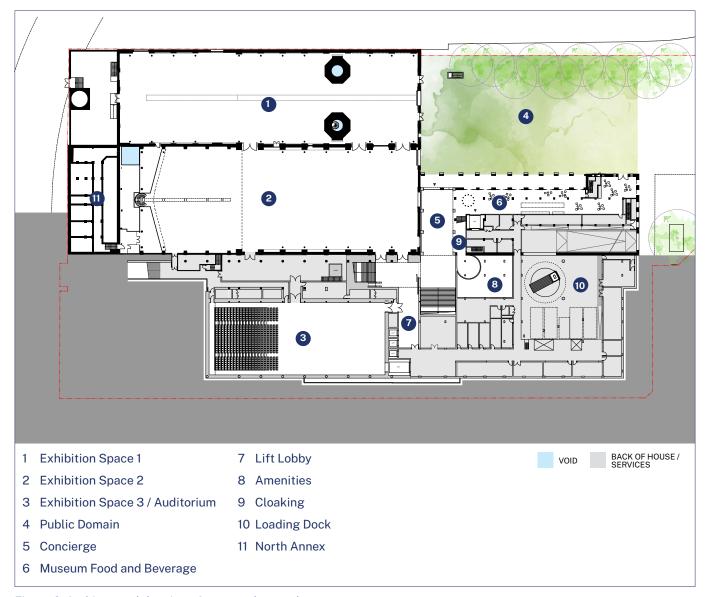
Architectural drawing of proposed ground floor of the Powerhouse Museum Ultimo Revitalisation (source: Durbach Block Jaggers & Architectus)
